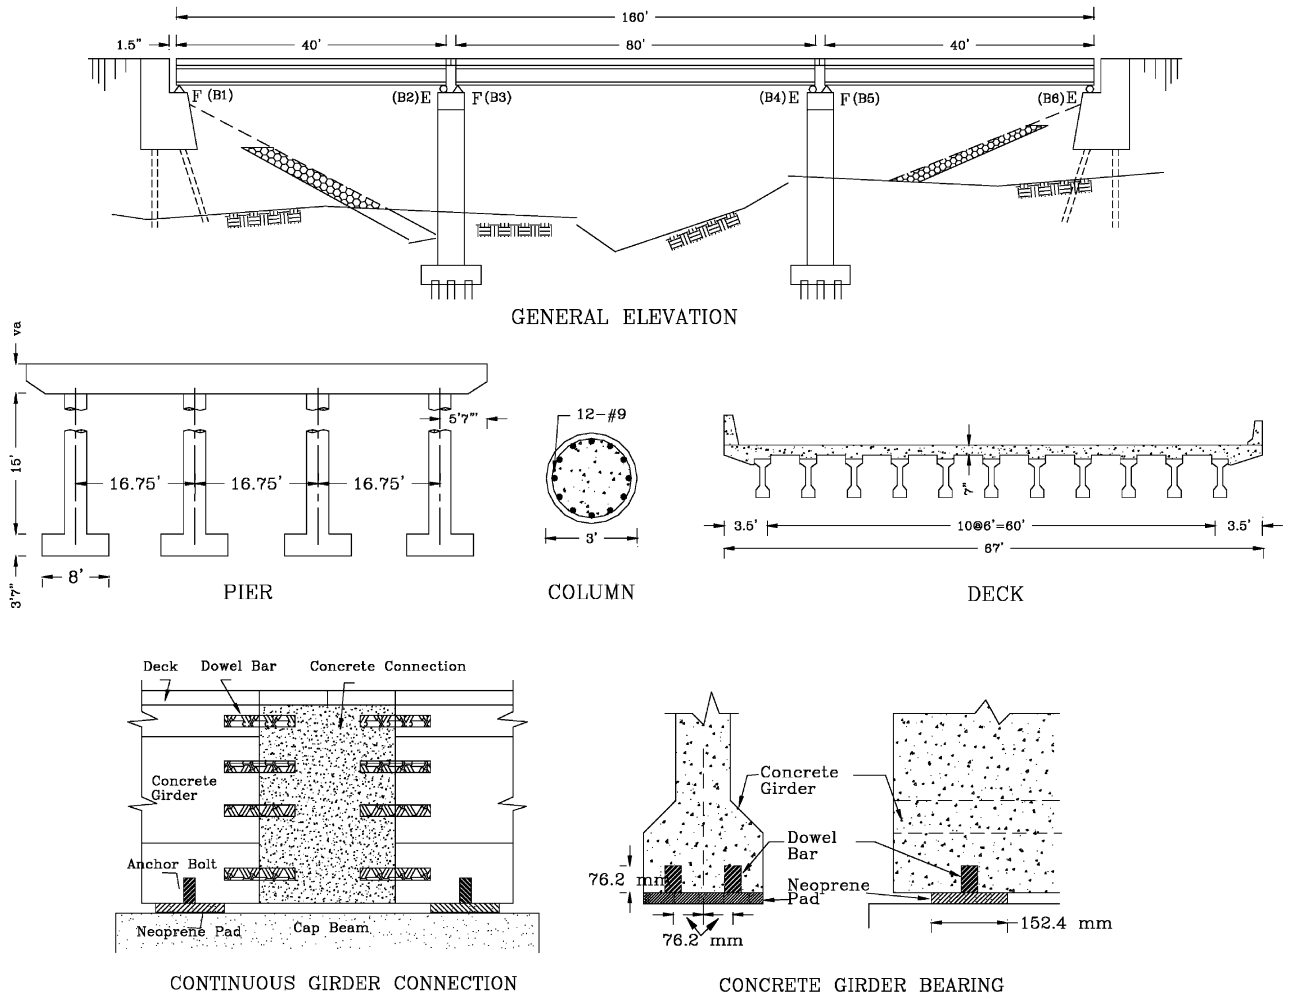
Typical multi-span simply supported and multi-span continuous pre-stressed concrete girder bridge in the Central and Southeastern United States.
